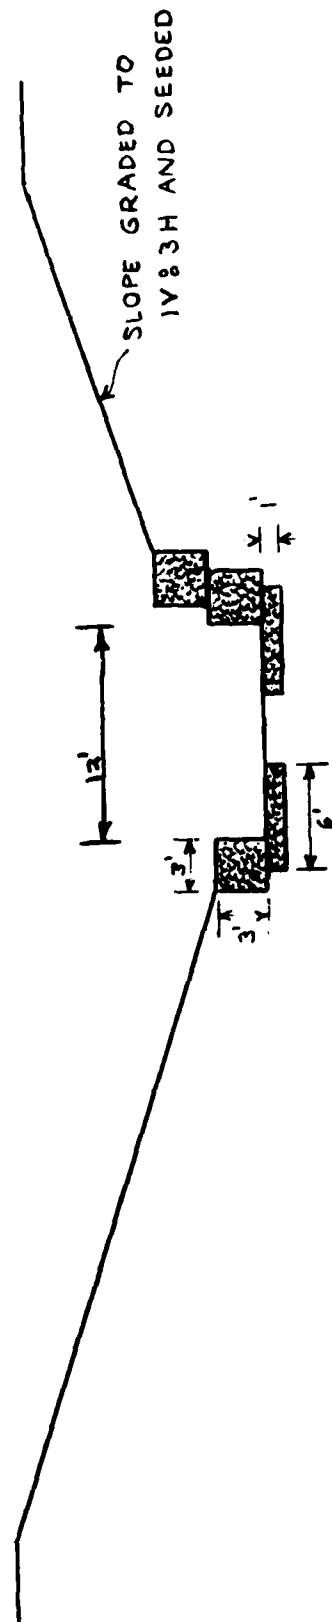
Typical cross section of Antelope Creek and Dead Man's Run, Lincoln, Nebraska
